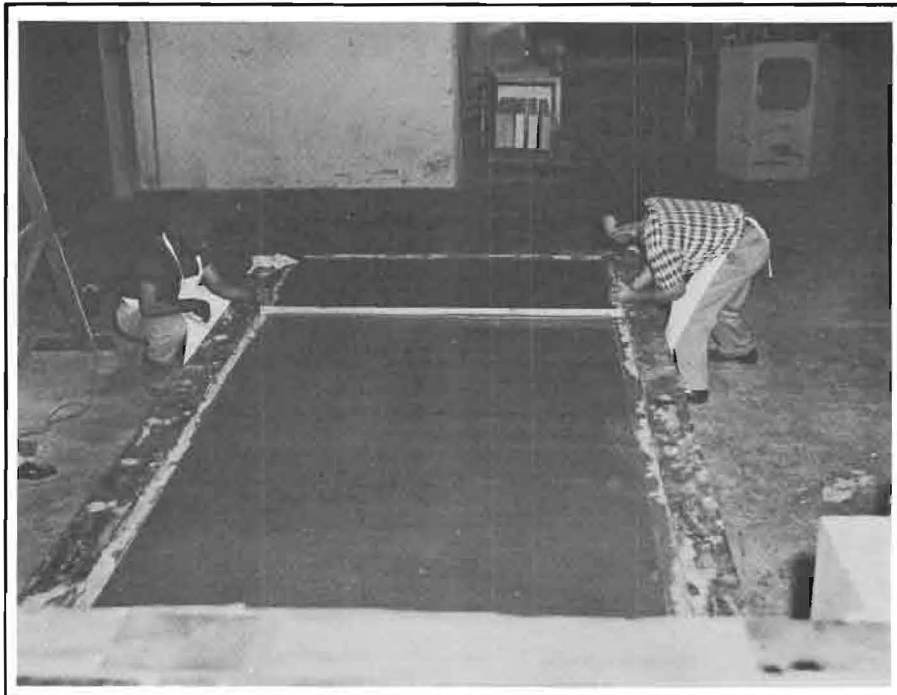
Strike-off procedure used in finishing the test slabs. Final finish was made by hand using a steel trowel.
